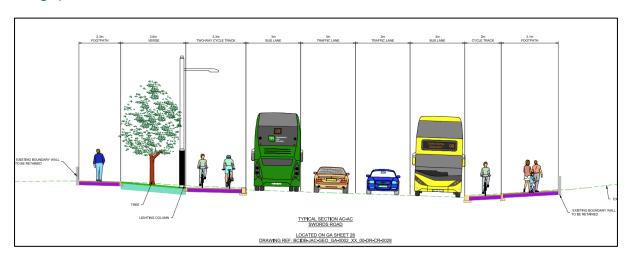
Extract from Typical Cross Section Drawing showing boundary wall retained
